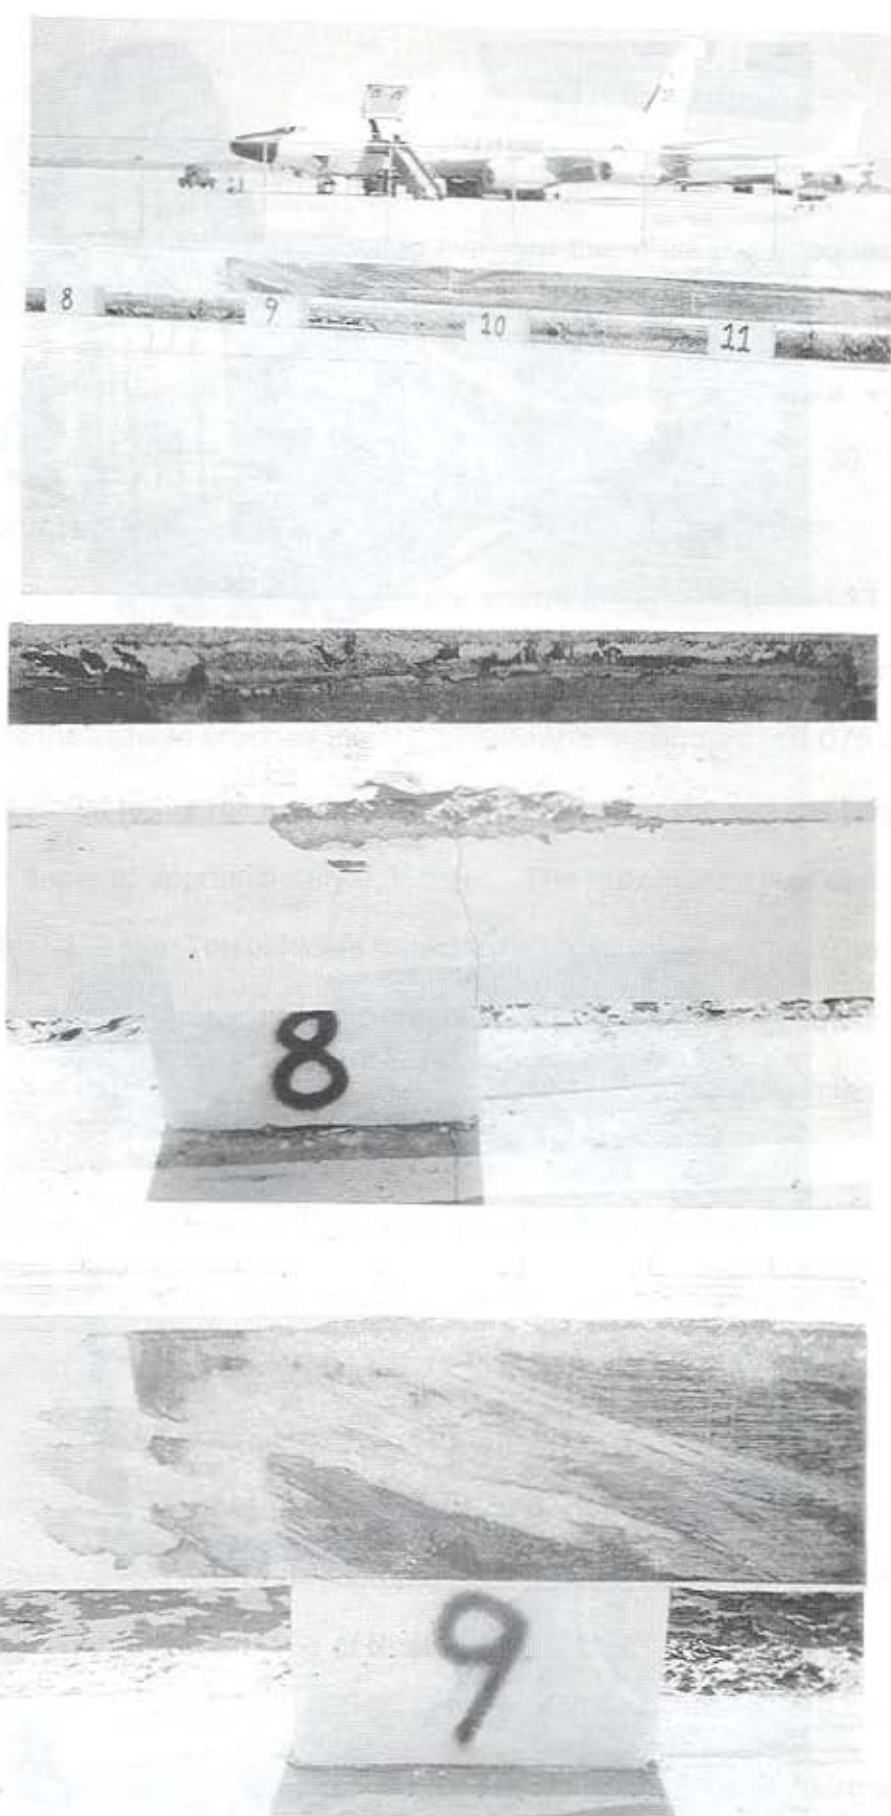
Bridge Rail Damage, Test NEOCR-4
